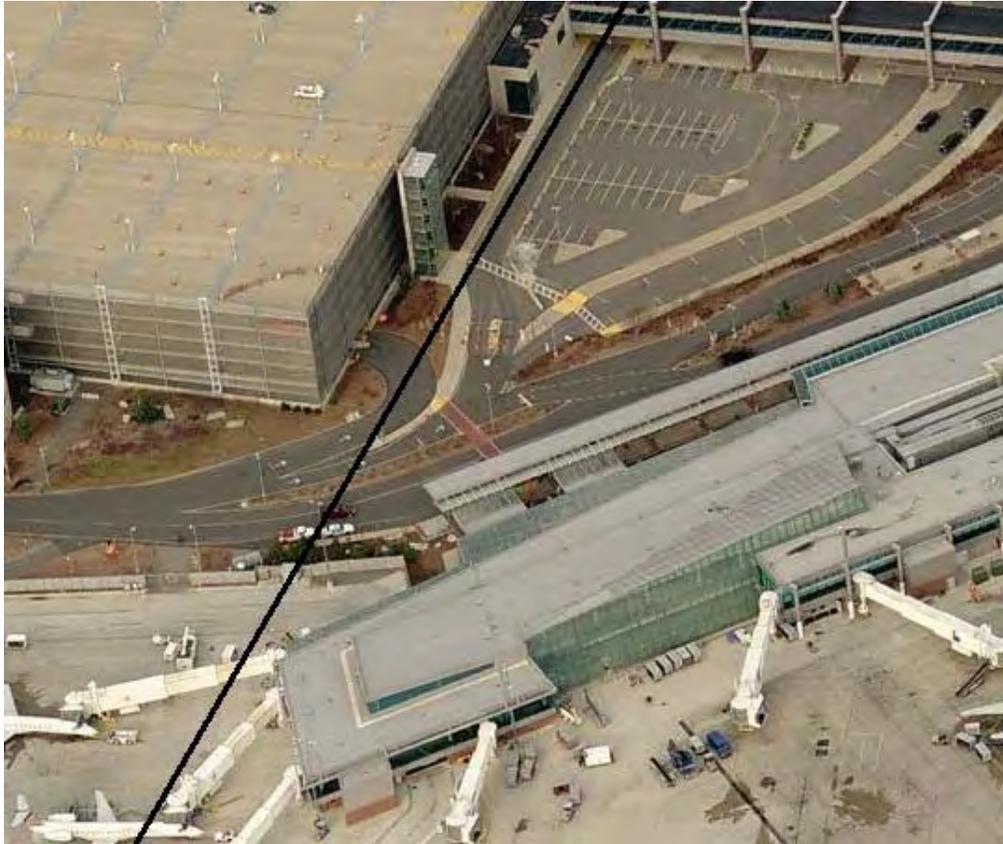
Approximate alignment of cut and cover tunnel, missing terminal building and continuing to a station in front of the parking garage.
